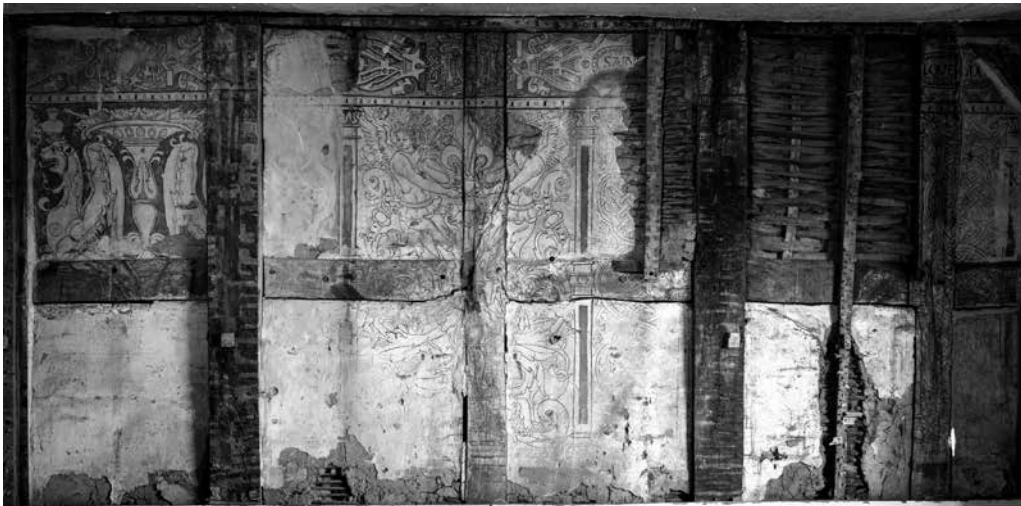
Church House Farm, Wellington. The 16th-century wall paintings exposed on the east side of the first floor of the crosswing. This is before cleaning and conservation.
